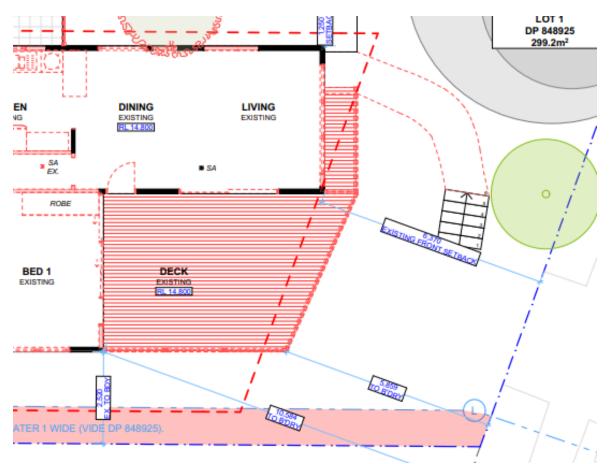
Excerpt from Architectural Drawing DA06 Existing Ground Floor Plan – Demolition Illustrating the existing front setback to the front deck
